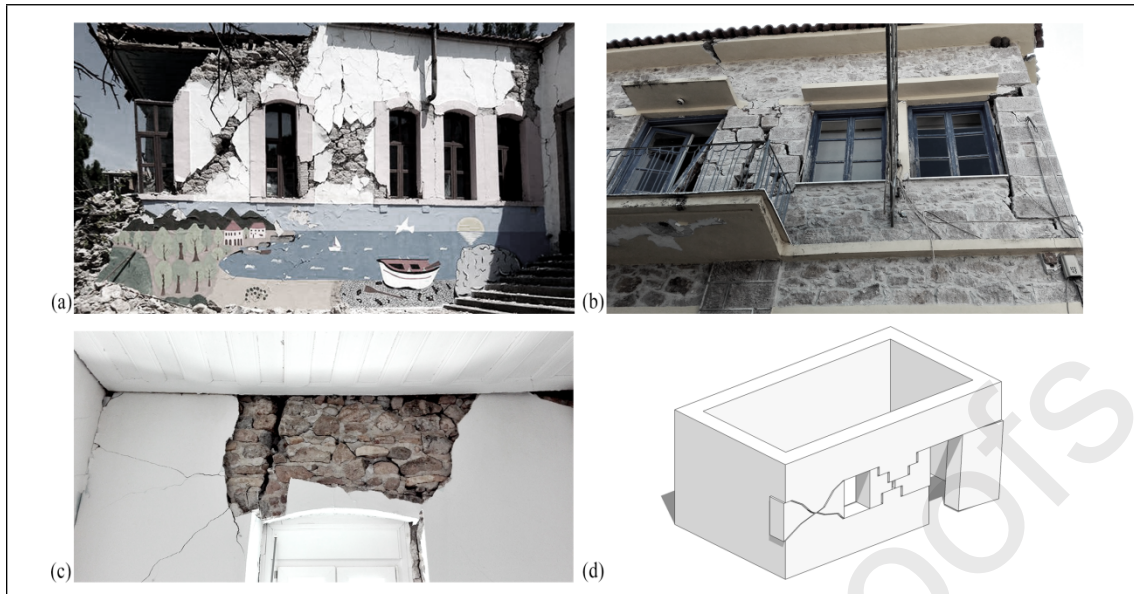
Typical in-plane damage pattern of: diagonal tension (two piers at the left of (a)), joint sliding (left pier of (b) and spandrel of (c)), flexural (right piers of (a), right pier of (b) and spandrel of (c)). Note that (a) shows the side façade of the elementary school of Vrissa settlement. (d) Schematic sketch of in-plane damage patterns.
